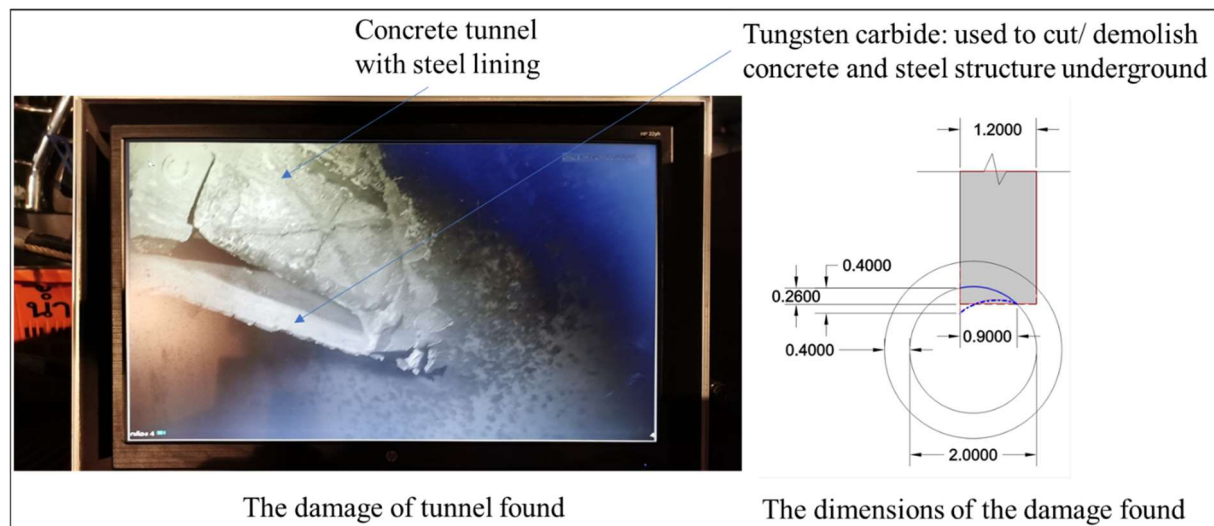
Concrete tunnel damage and dimensions of tunnel with a steel lining 17m underground
